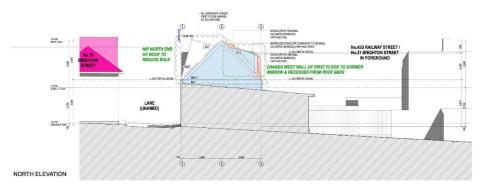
View from Brighton Street showing relative heights and massing of proposed development (blue) compared to form and height of 19 Brighton Street (pink) to east and 53 Railway Street (outlined) to the south. (Ref: DA page 12/32)
